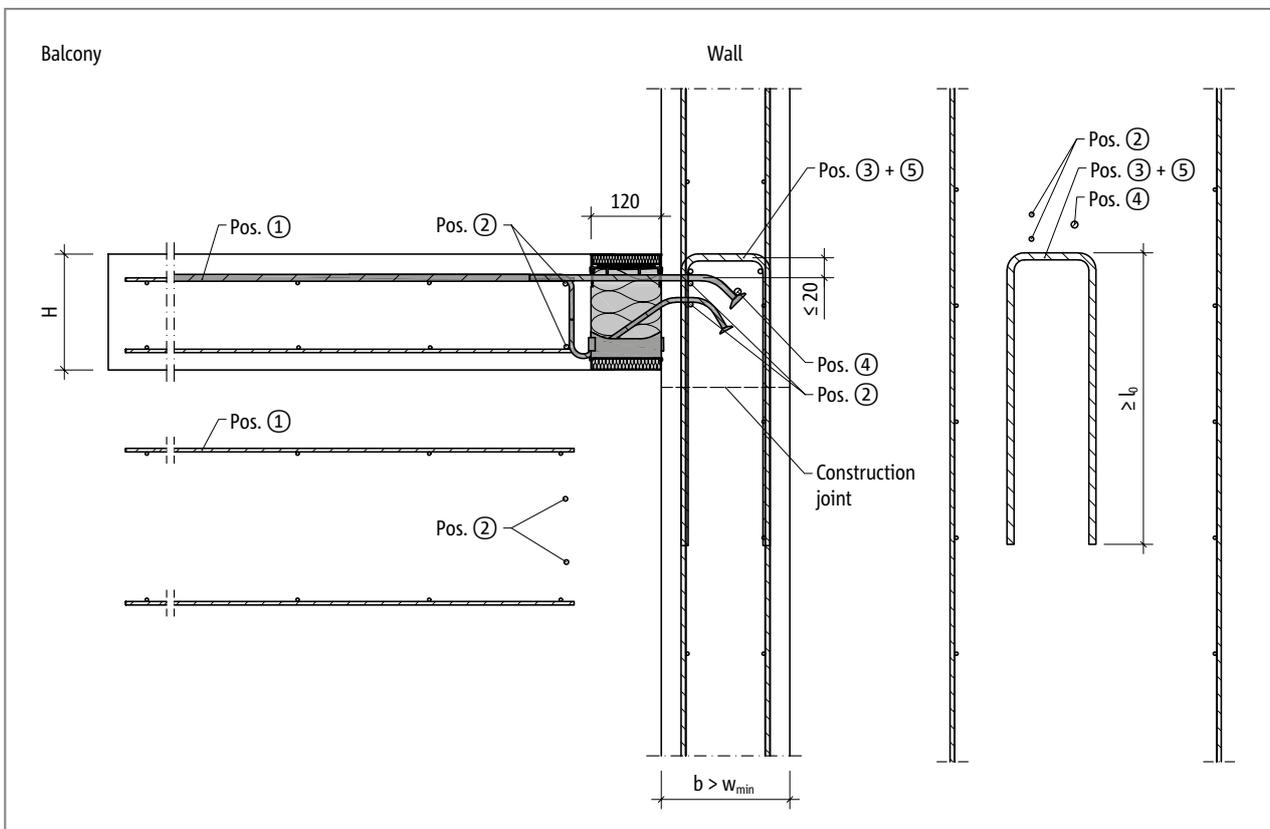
Schöck Isokorb® XT type K-O: On-site reinforcement for wall connection with larger structural element dimension ($w_{vorh} > w_{min}$)
